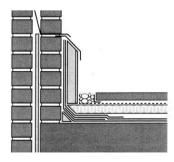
Standerd Detail around Asphalt Roofing. (UK)[15]
